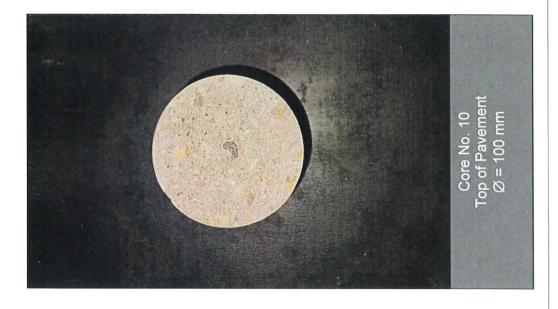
Specimen from Stradbrook Avenue, South Curb Lane
